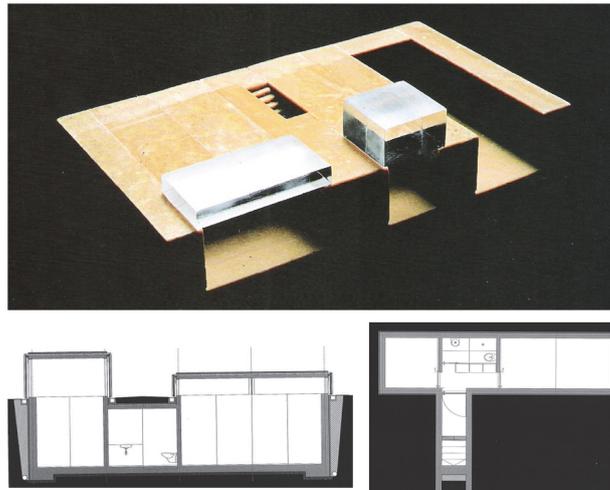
Bouçós farm house section and plant (Brandão Costa, 2008)
